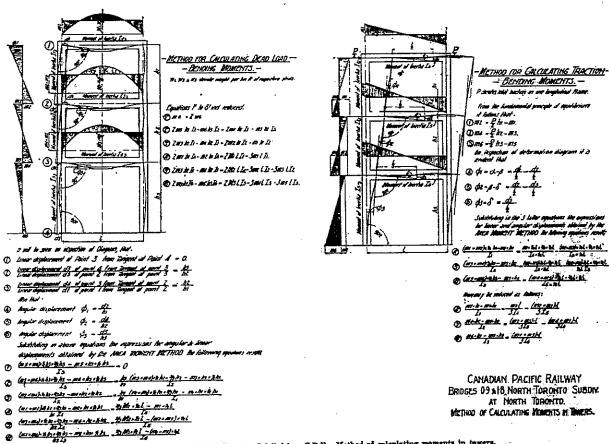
Bridges on North Toronto Subdivision, C.P.B. Method of calculating moments in towers.
